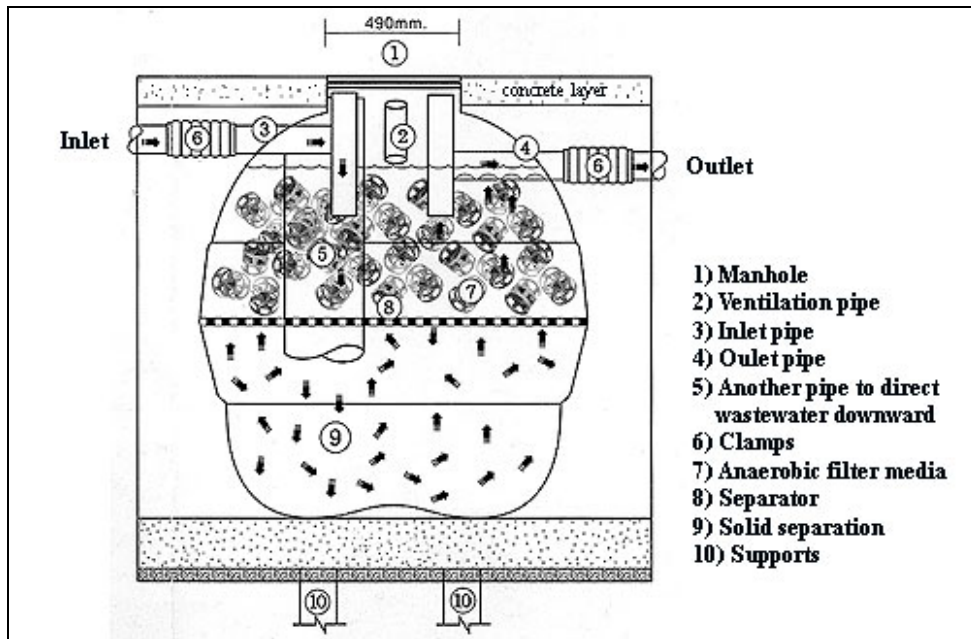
A modern septic tank that is used to treat household wastewater (<http://www.ptthai.com>)
